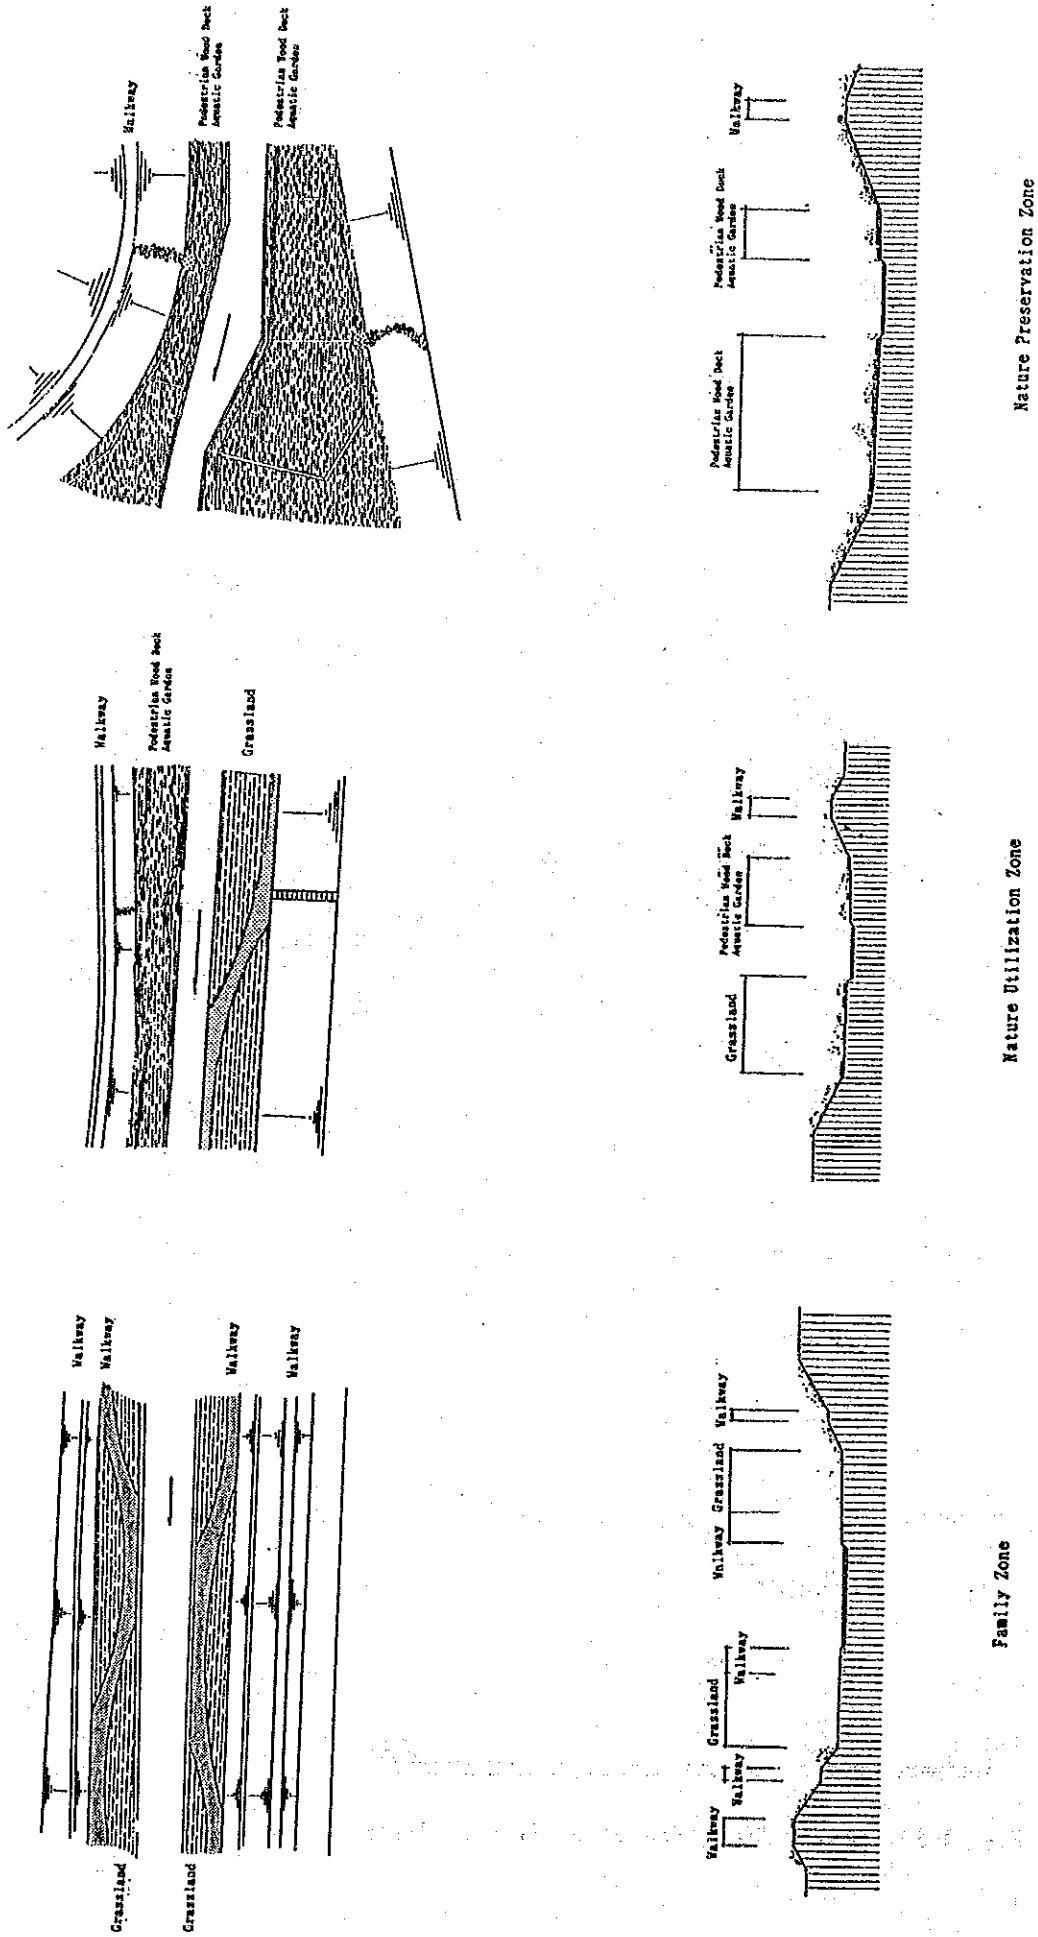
Space Improvement Plan of Yangjae Chong on Every Zone
